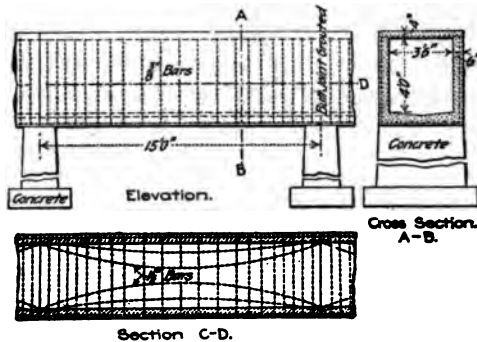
Section of Salt Lake City Conduit on Piers.
